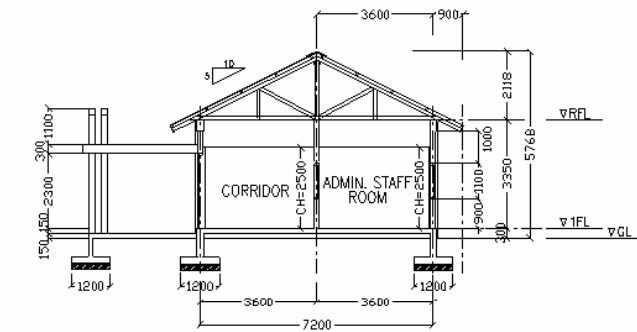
Elevation and Section of Batu Ampar VTS Center
